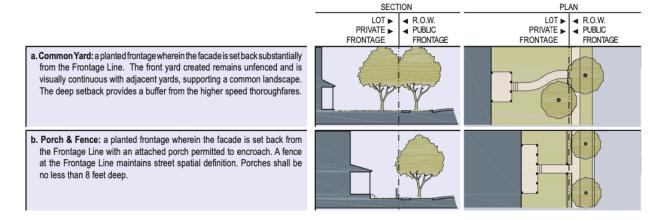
Private Frontage - the area between a building Facade and the street, inclusive of its built and planted components. Frontage is divided into private Frontage and public Frontage.
